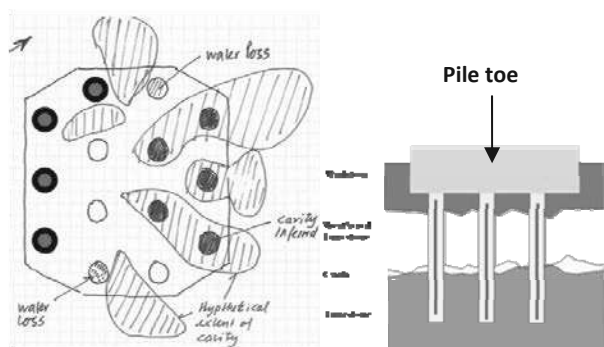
(a) Hypothetical extent of cavity feature (piles with bold outline were drilled into Limestone); (b) Schematic cross section at pile toe in Marlstone with pre-drilling holes below pile toe.
